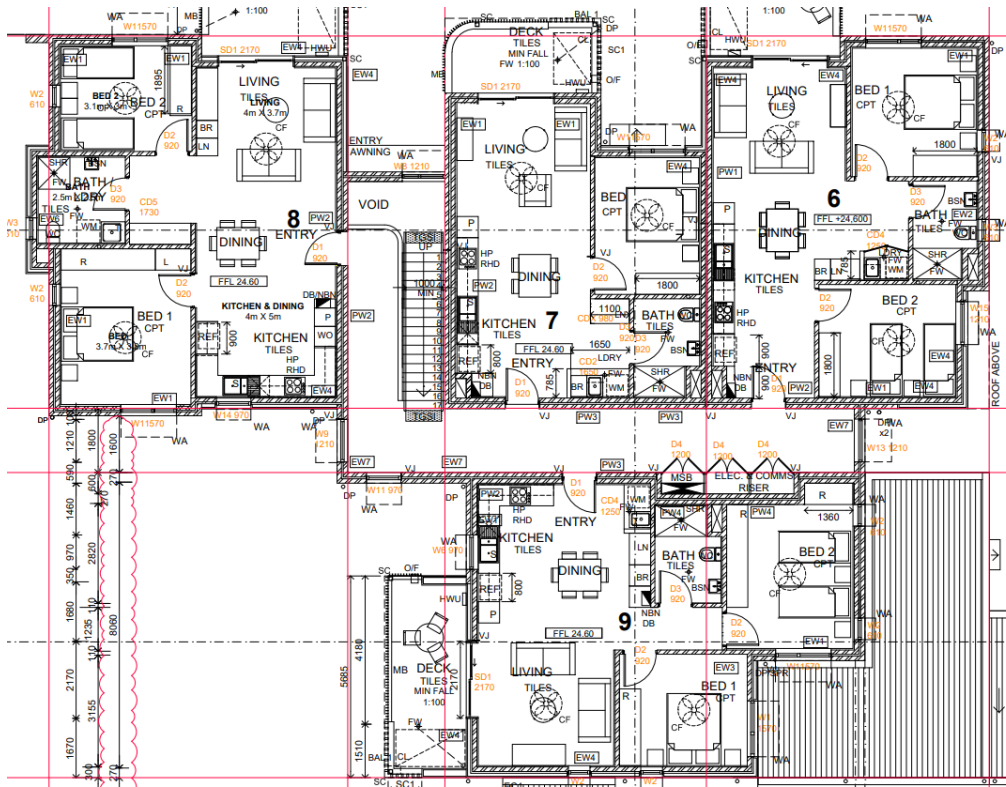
First floor plan: The first floor is of reinforced concrete slabs supported by load bearing masonry walls.
